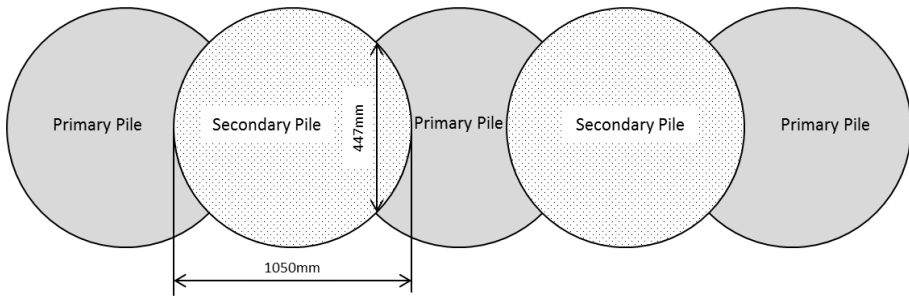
General secant piling arrangement for construction of the cut-off drain.
